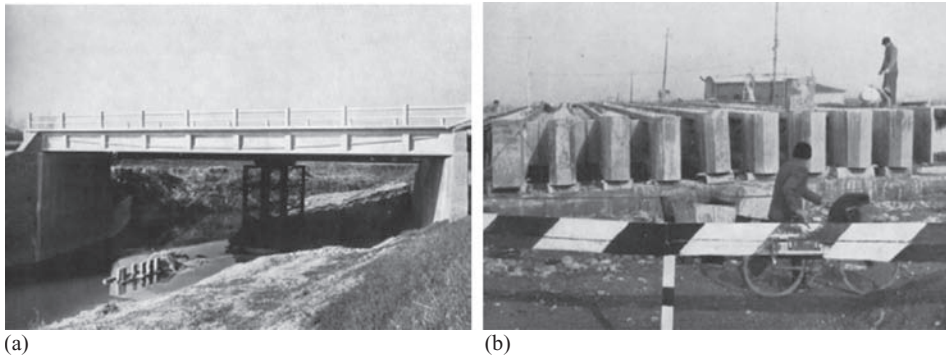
The Samoggia Bridge near Bologna (a) Overall view; (b) Under construction.
